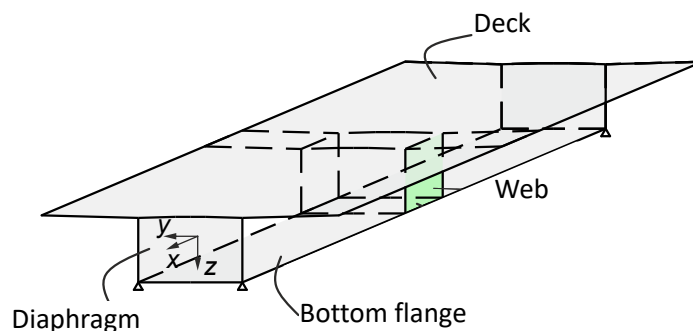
Schematic drawing of a box girder bridge. Source [1]
